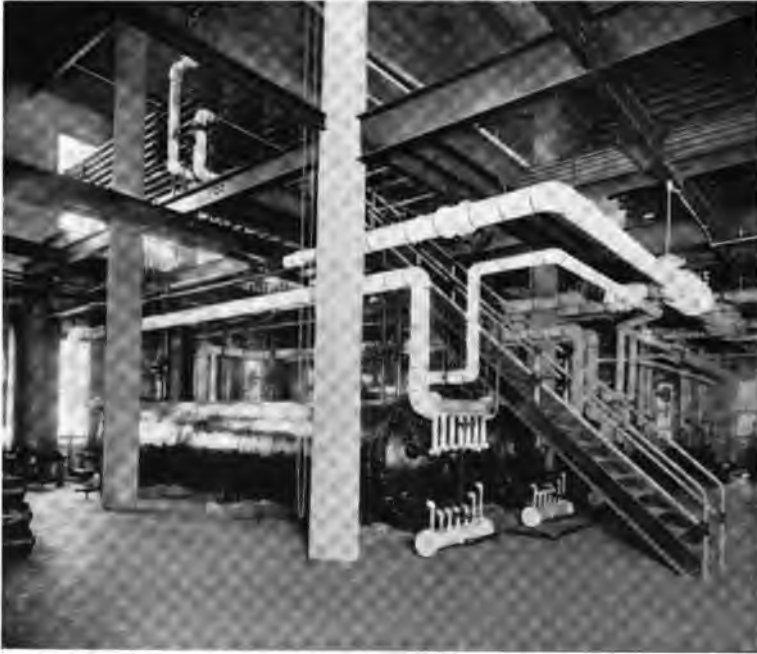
REFRIGERATING MACHINERY ON TOP FLOOR.
